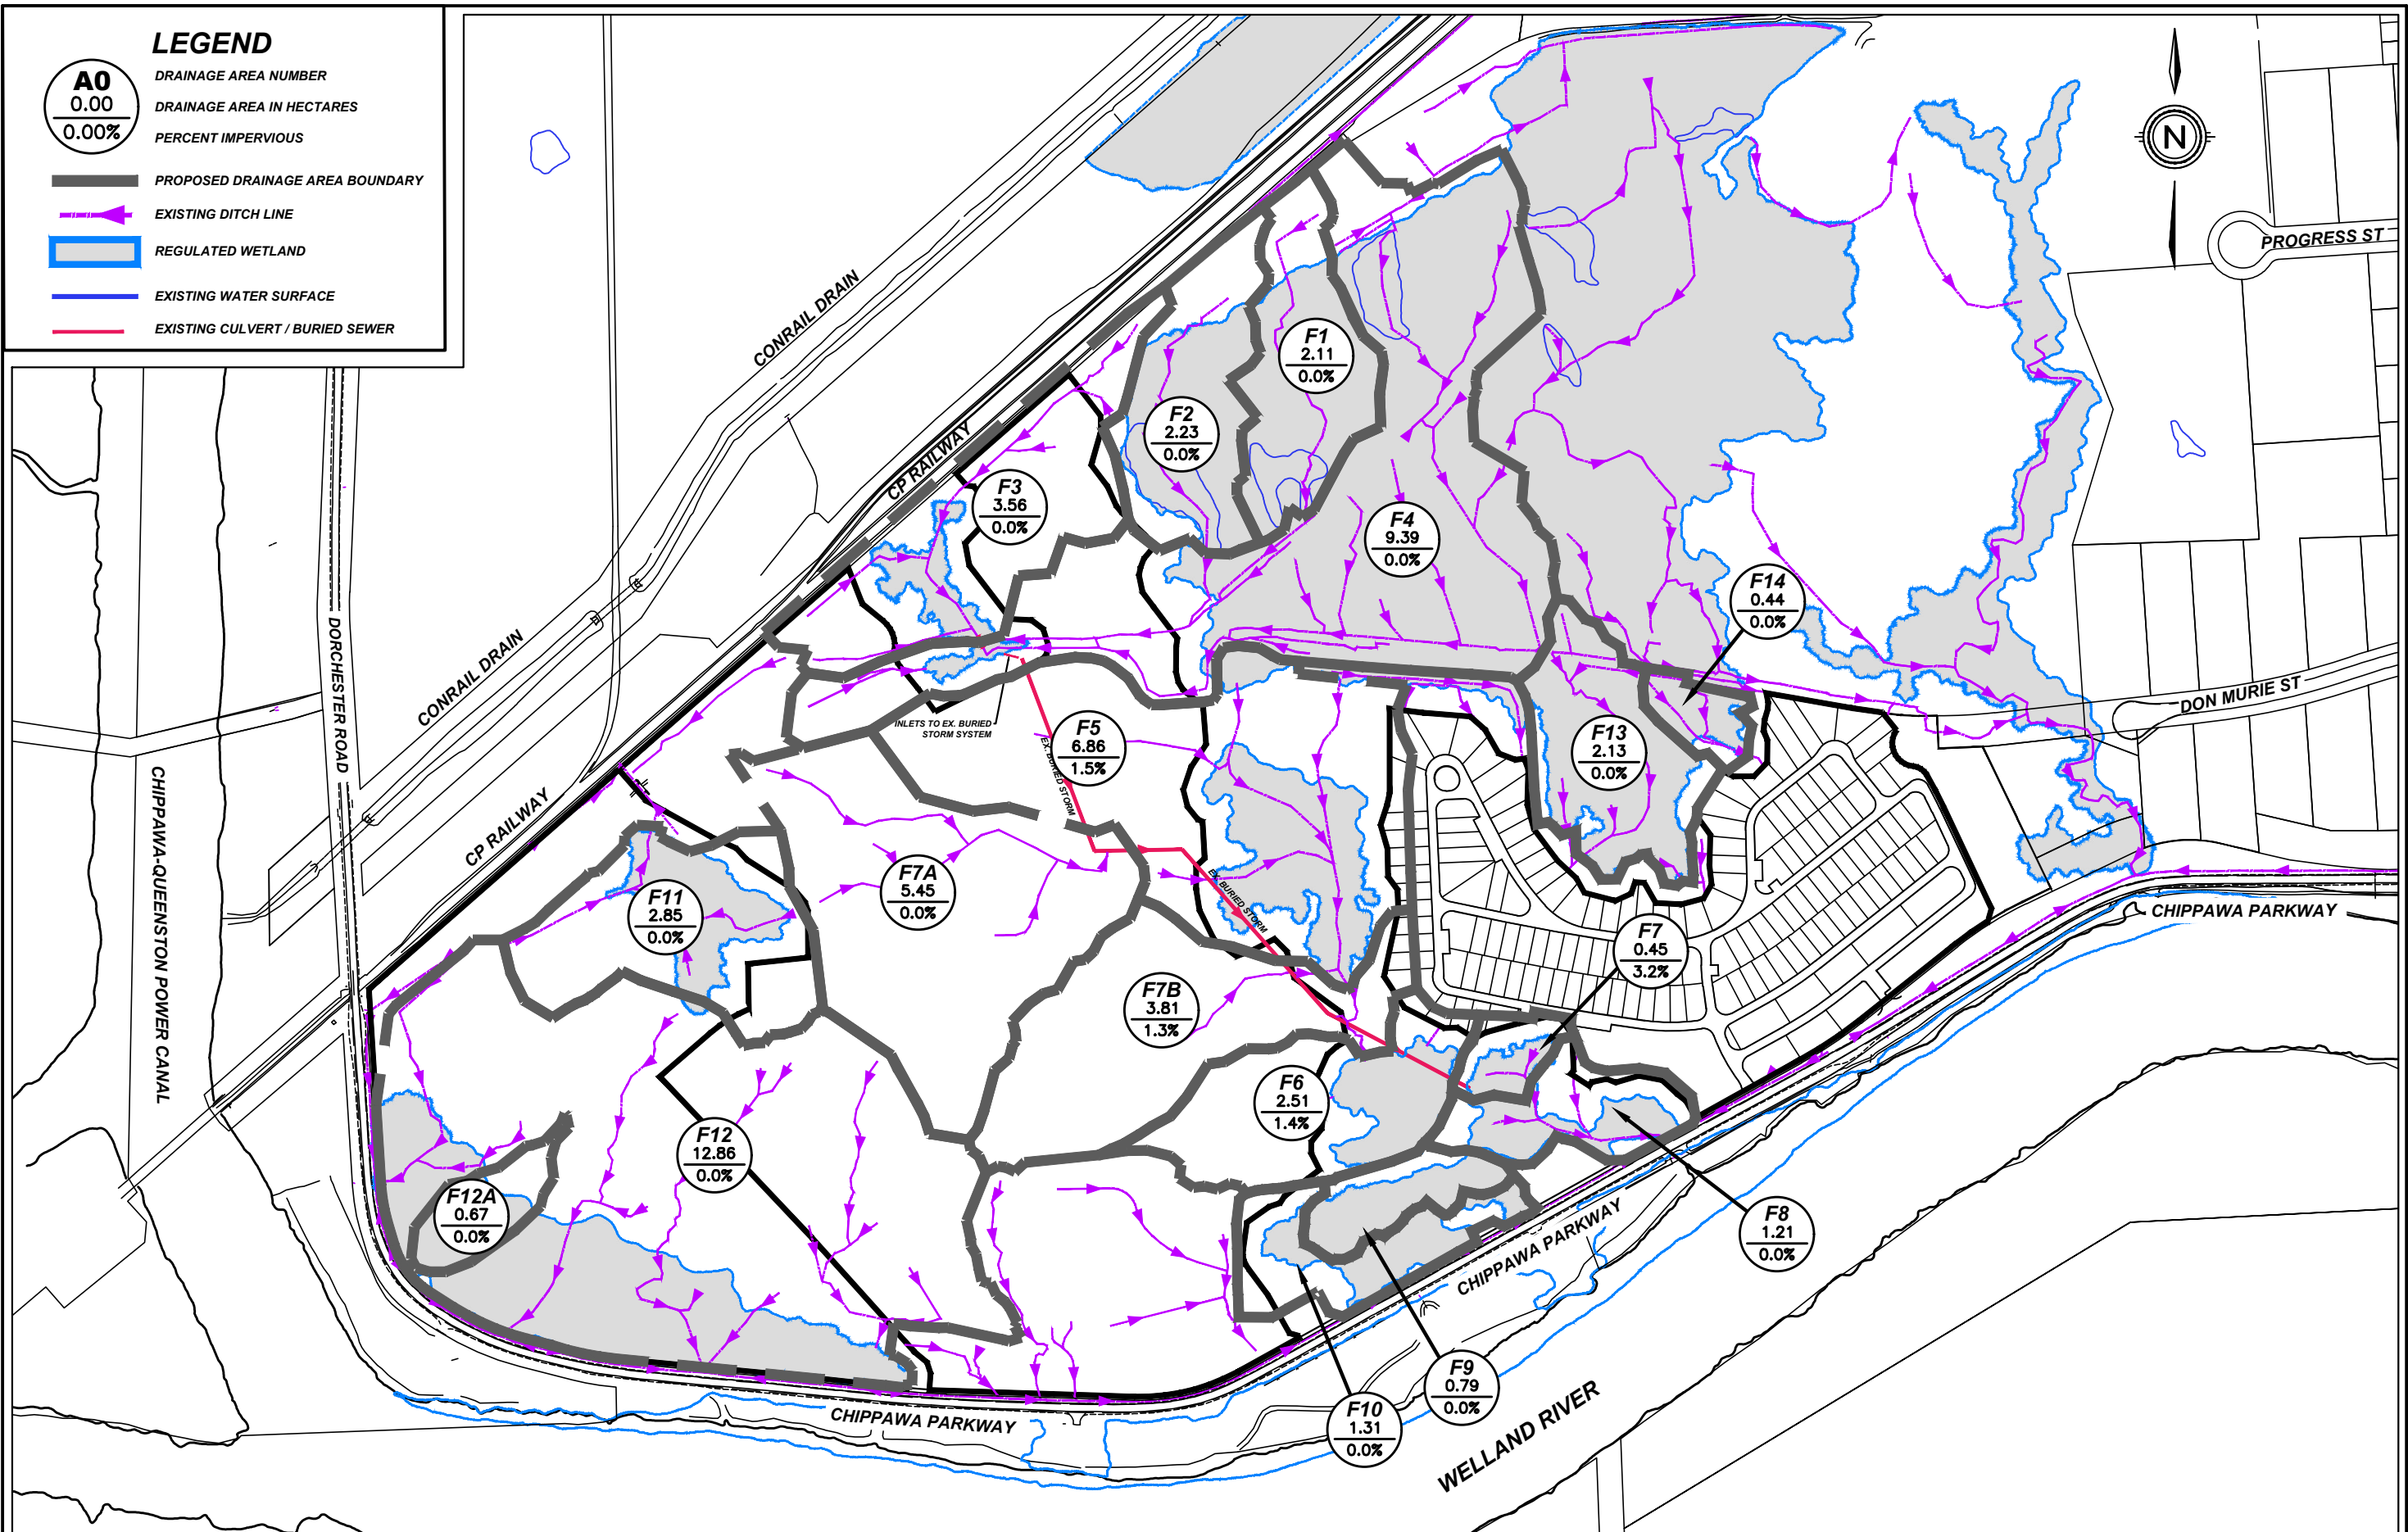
Schematic of Proposed Wetland Drainage Area Plan (Phase 1)
